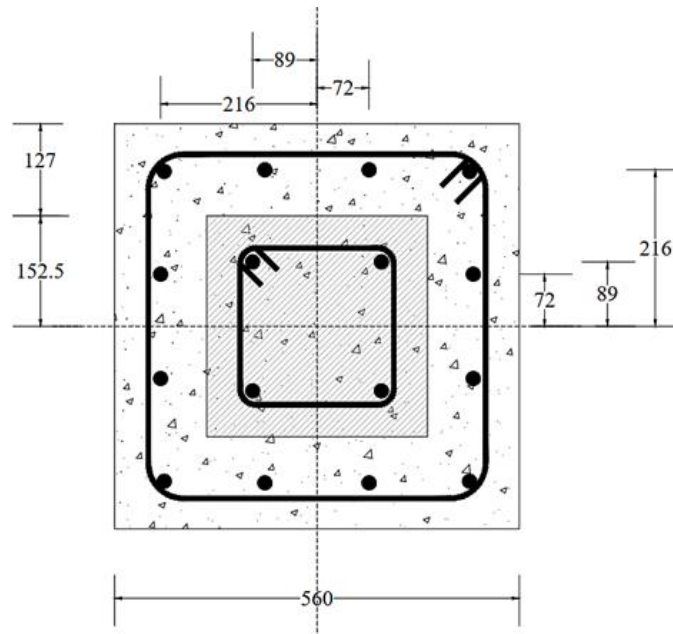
Cross-section of the retrofitted column (unit: mm).
